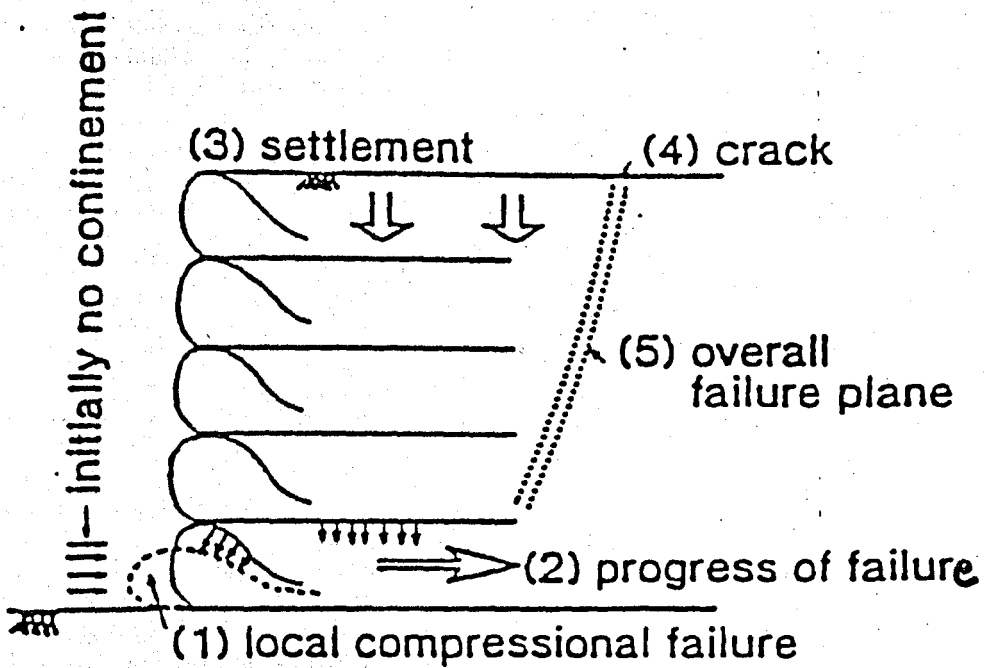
Progressive failure starting from a local compression failure of soil immediately behind the wall face (Tatsuoka, 1993)
